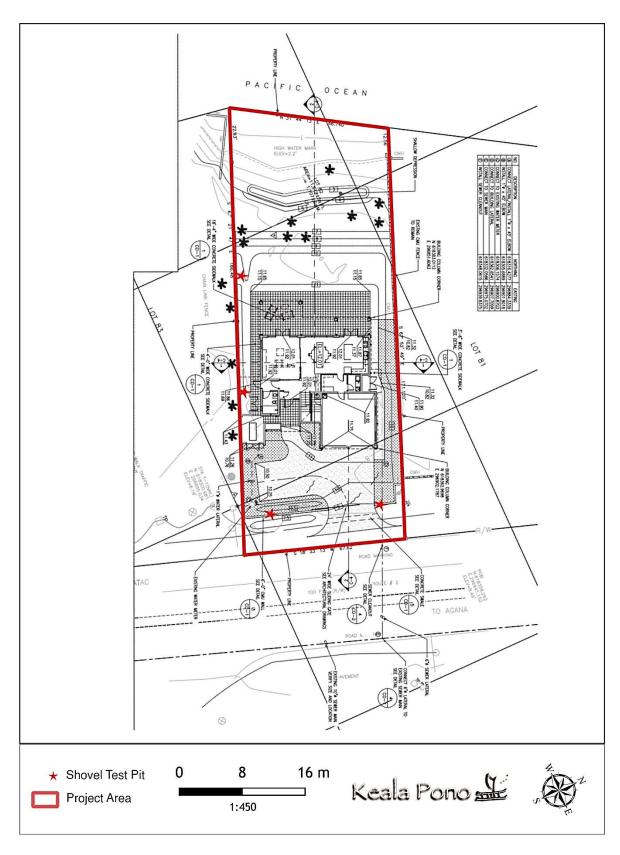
Proposed construction plan, with proposed Shovel Test Pits.
